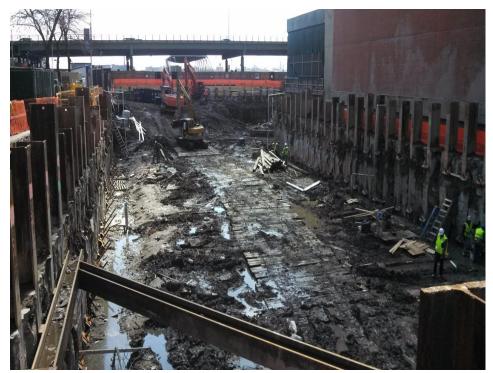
View of soil excavation and direct loading into tri-axel dump trucks. 4/4/2014
